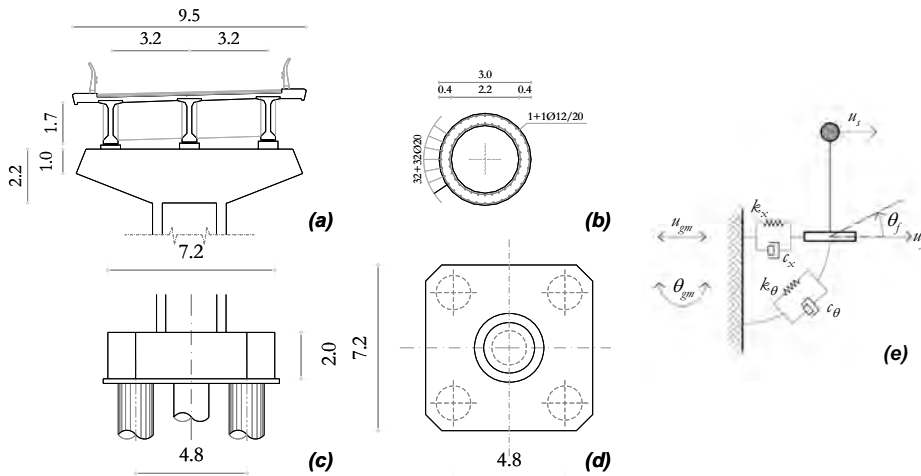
Simply-supported deck on single-stem hollow-core pier founded on piles.
